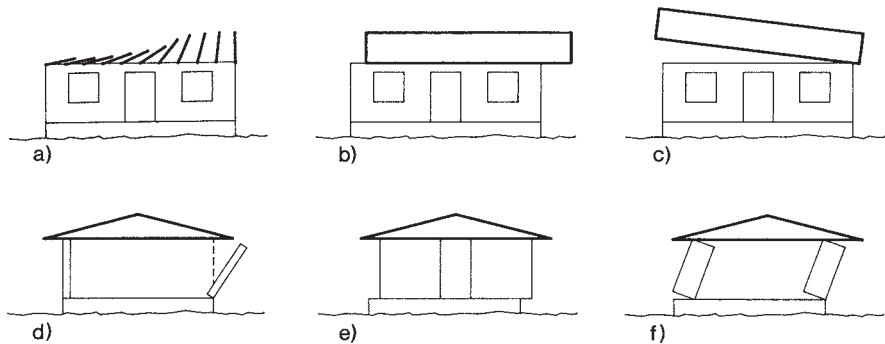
The stability of the house is ensured by anchoring the various structural elements to each other. The roof trusses must be braced to prevent them from cascading (a) and anchored against horizontal forces (b) and upward-acting forces (c). The walls must be supported at the top by the ceiling plate (d), and this must be able to transmit horizontal forces to the wind-bracing walls. In some cases, the walls must also be anchored at the bottom to prevent sliding (e) and collapse or lifting (f).
